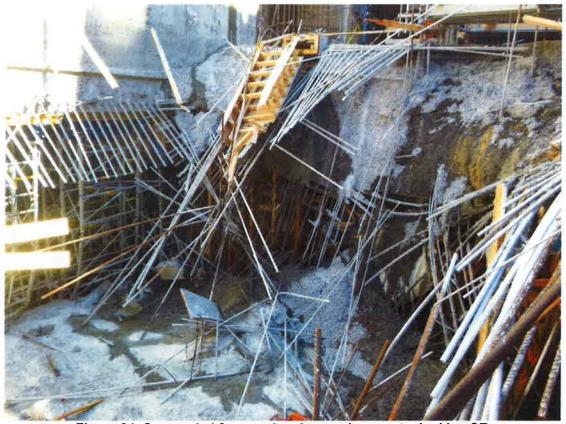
Suspended formwork, rebar, and concrete, looking SE
